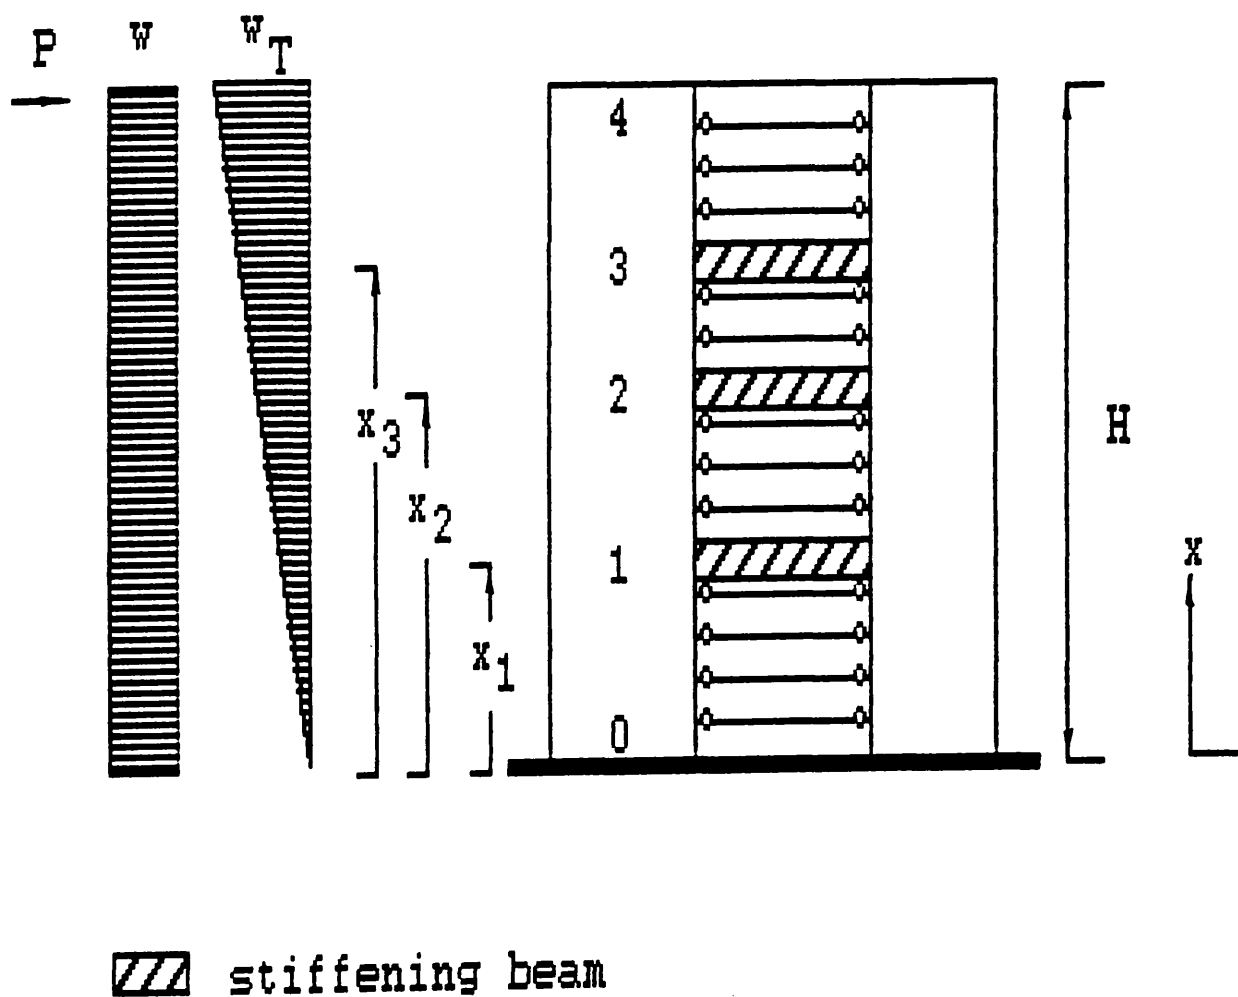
A LINKED SHEAR WALL STRUCTURE WITH THREE INTERMEDIATE STIFFENING BEAMS
